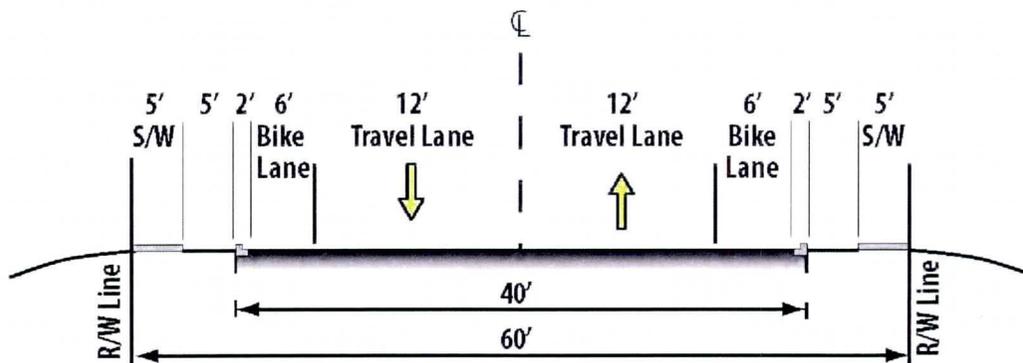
Ultimate Roadway Cross Section – Lost Dutchman Boulevard to McDowell Boulevard
